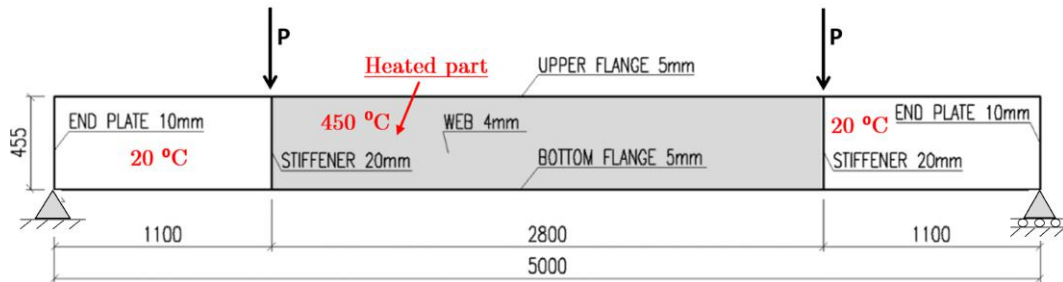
Elevation view of the beam used in the COST 2 benchmark, showing the geometry, position of point loads and the heated area. Adapted from COST (2014).
